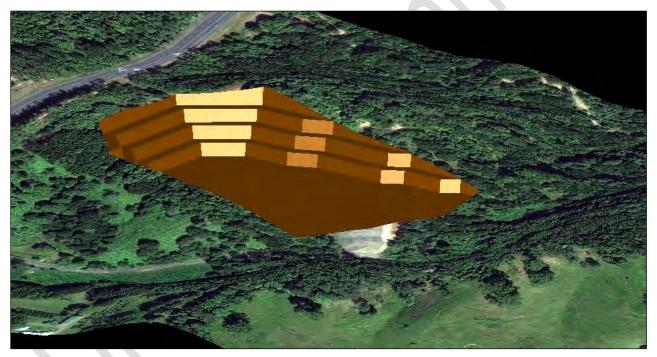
Aerial View of the Proposed Design Developed for Stokers Pit
